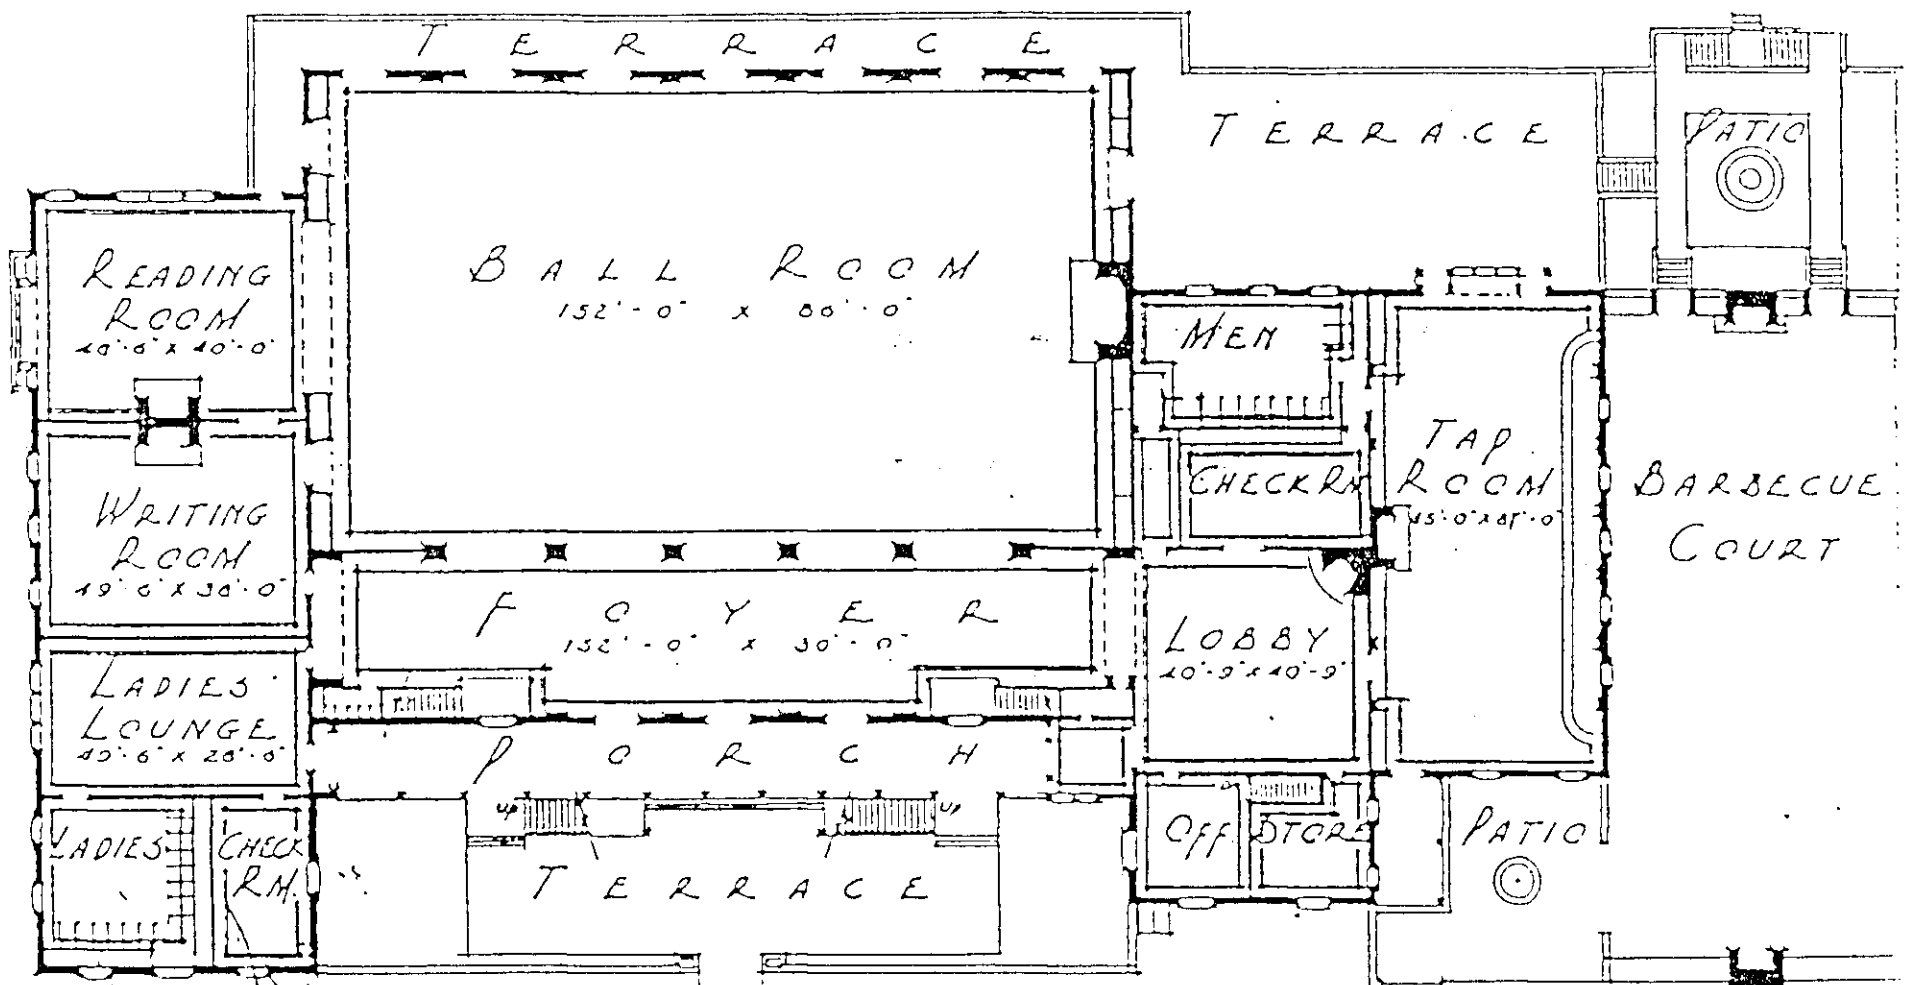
SOLDIER'S CLUB FLOOR PLAN
